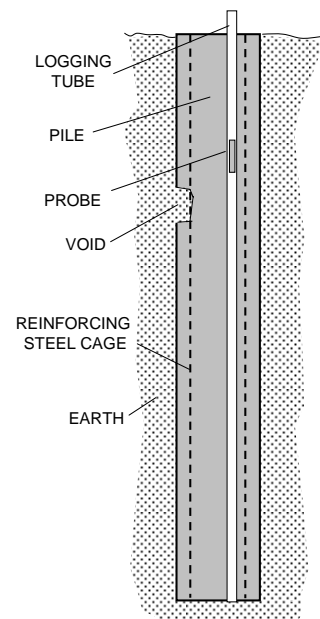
Illustration of drilled shaft piling. Cutaway view shows void exposing reinforcing steel.
